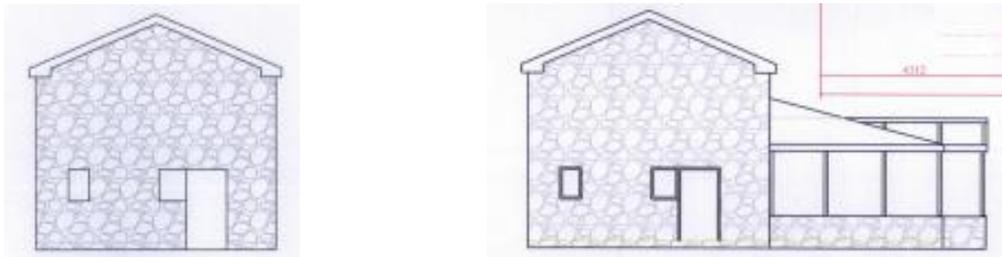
Existing Side Elevation Figure 5. Proposed Side Elevation
